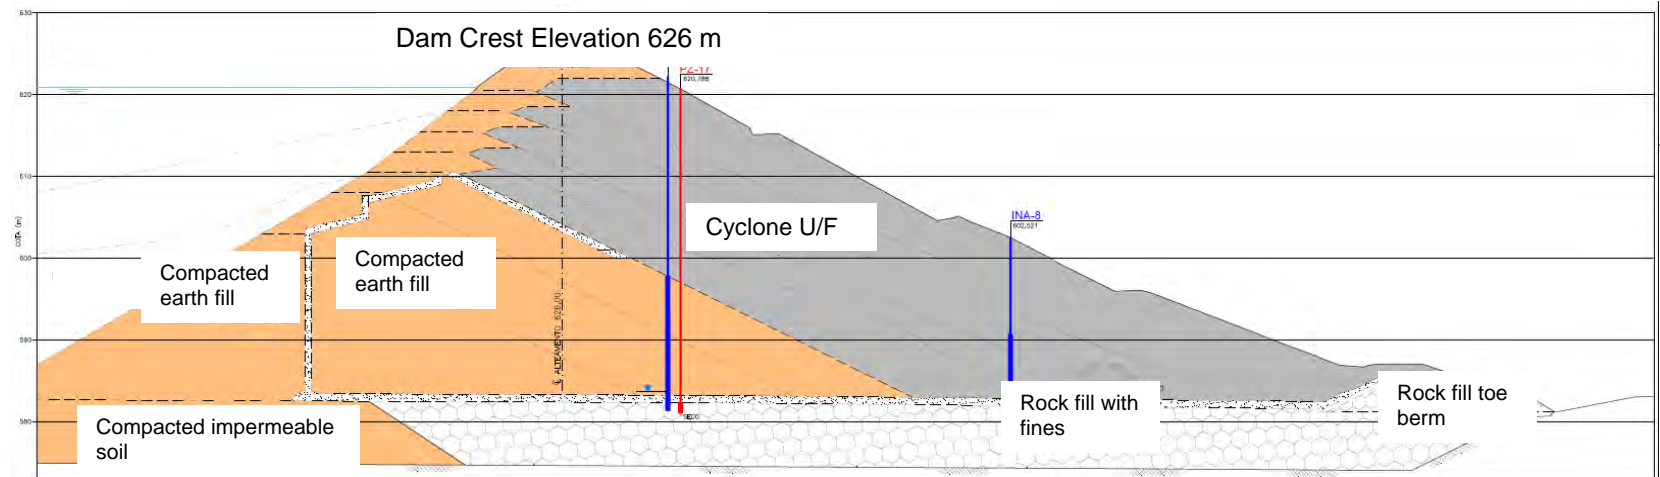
shows a general layout of the Aroeira TSF embankment and spillway, with the Santa Catarina River to the east. Figure 20-2 displays a typical cross section of the Aroeira embankment with vertical and horizontal drains and compacted cyclone underflow (grey) used for construction of the downstream embankment raises. A 4 m to 5 m wide section of compacted earth fill is used to cap the crest of the dam.
